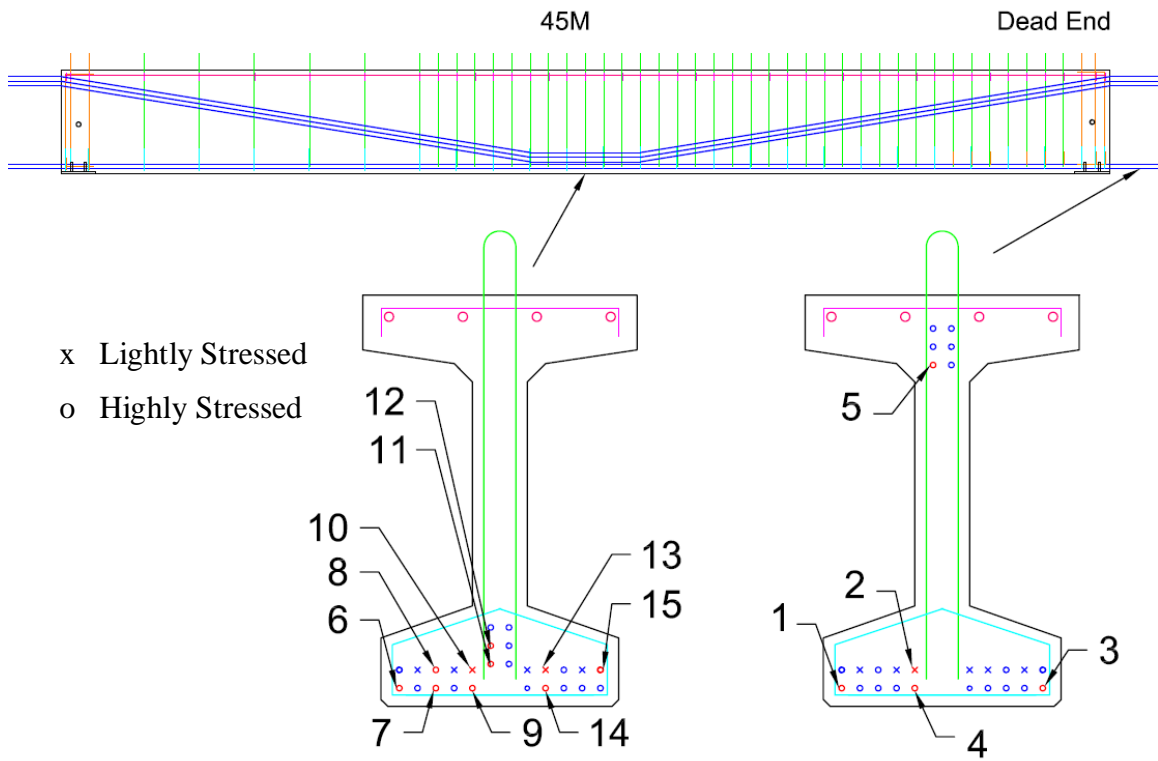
Prestressing strand strain gage locations and naming convention for the 45M girder. The cross-sectional view is looking down the girder from the dead end.
